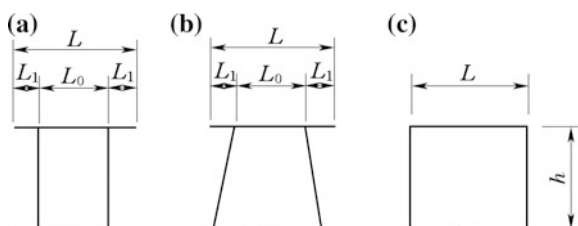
Horizontal girders framework—arrangement of arms (plan)
